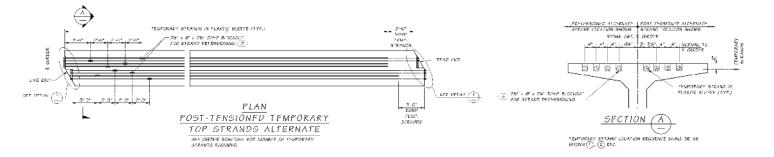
Excerpt from Washington State Department of Transportation standard details for pretensioned and post-tensioned temporary top strands. All Figures: Washington State Department of Transportation.
